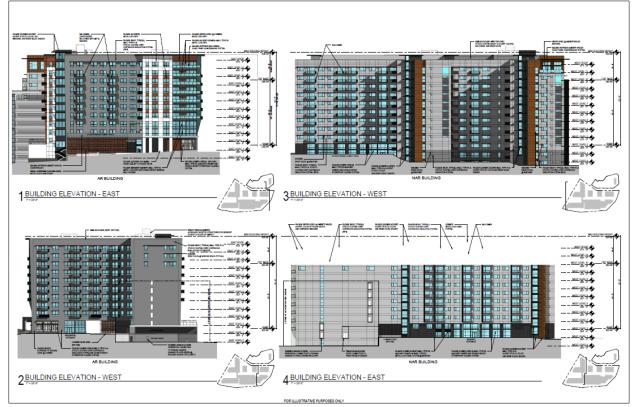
Residential Building Elevations (age-restricted building on left, non-age restricted building on right)
